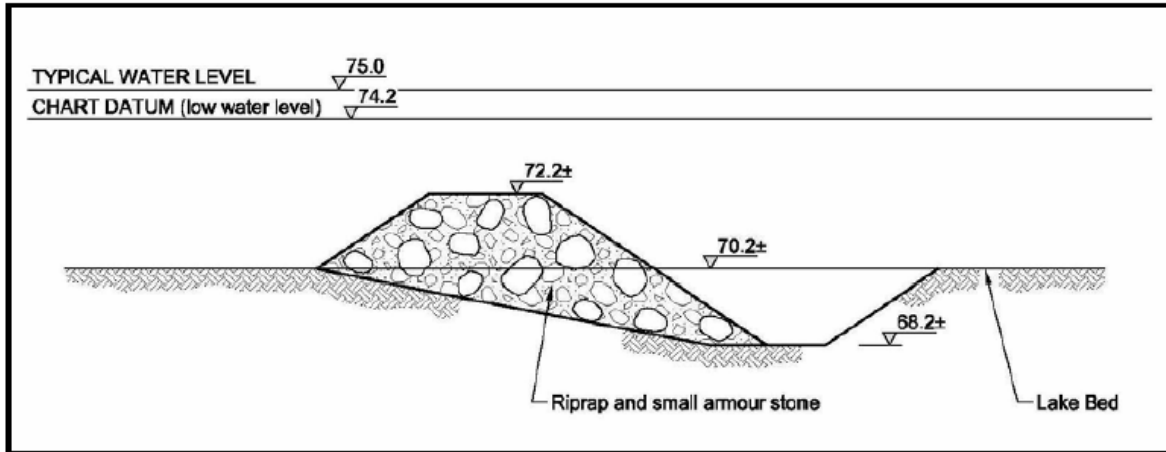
Typical sill cross-section. *Source: Shoreplan Engineering Limited, 2007.
